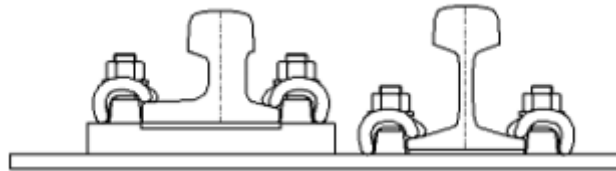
Sole plate of the switch heel with a levelling plate below the switch rail profile
